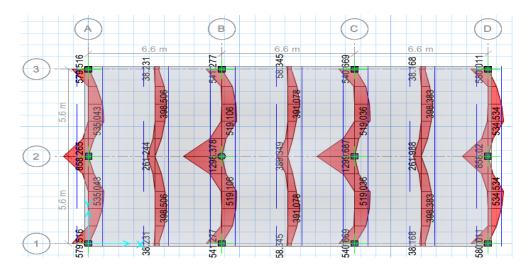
Along shorter side reinforcement(SAFE:EC2, without staggered column)
